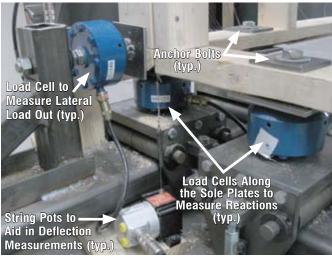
Close-up of Anchor Bolts, String Pots and Load Cells
